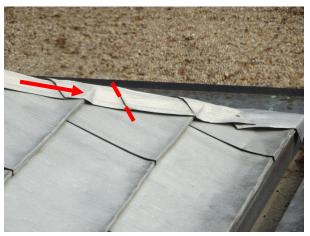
Roof ridge with reverse-lapped shingles. Arrow shows desired direction of water flow away from building. The seams between the panels (dashed line) would allow water to enter the seam.
